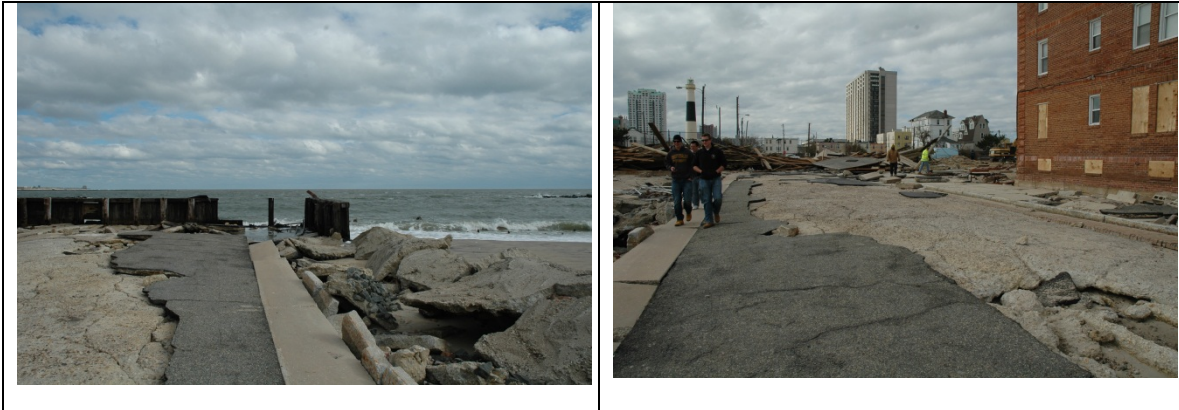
Erosion undermined the foundation causing significant damage to walkways and roadways.
